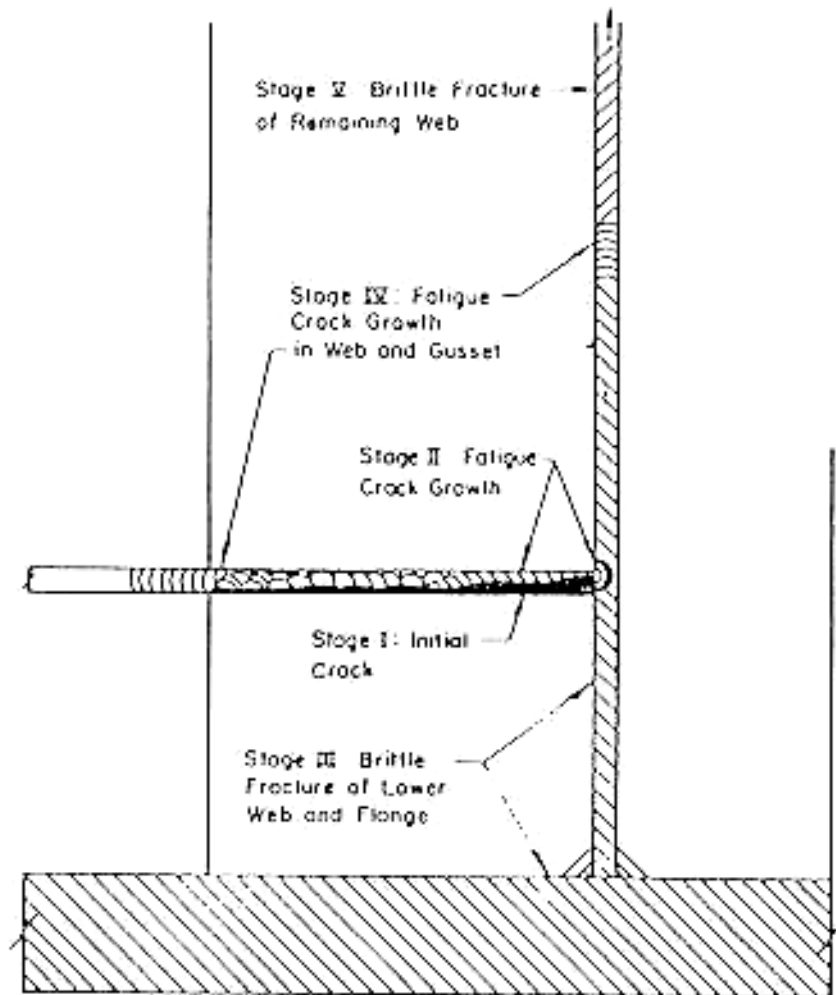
Position of crack in Lafayette Street Bridge (Fisher et al, 1977)
